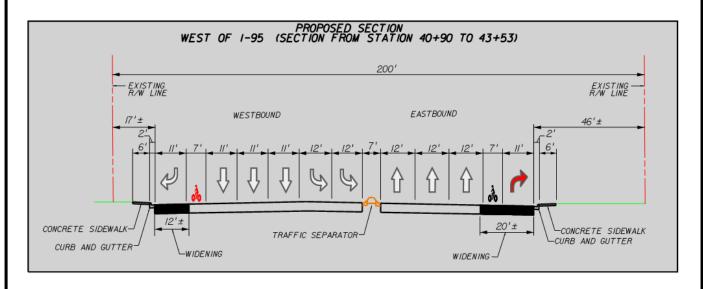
shows the proposed typical sections for Alternative 2. From Northpoint Boulevard to the I-95 southbound ramp terminals 45th Street would provide three 12-ft through lanes, two 11-ft left turn lanes and one 12-ft right turn lane in each direction with a 7-ft traffic separator. From the southbound ramp terminal to the northbound ramp terminals this section would provide two 12-ft through lanes, one 12-ft shared through-left lane, and one 12-ft left-turn lane in each direction with a 12-ft barrier. From the northbound ramp terminals to Congress Avenue 45th Street would provide three 12-ft through lanes and one 12-ft left-turn lane, with triple left turn lanes at Congress Avenue. This section would also include 6-ft bicycle lanes and 6-ft sidewalks.
